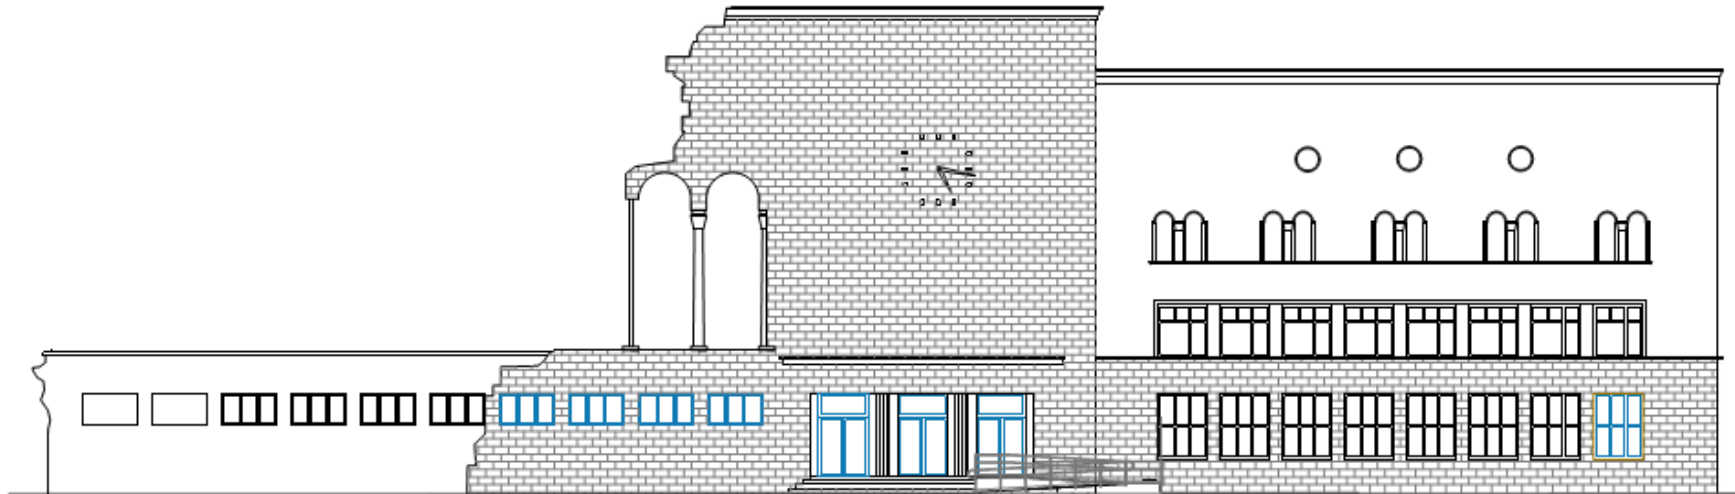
Newly designed situation north facade (with blue color are shown location of new windows and doors)
